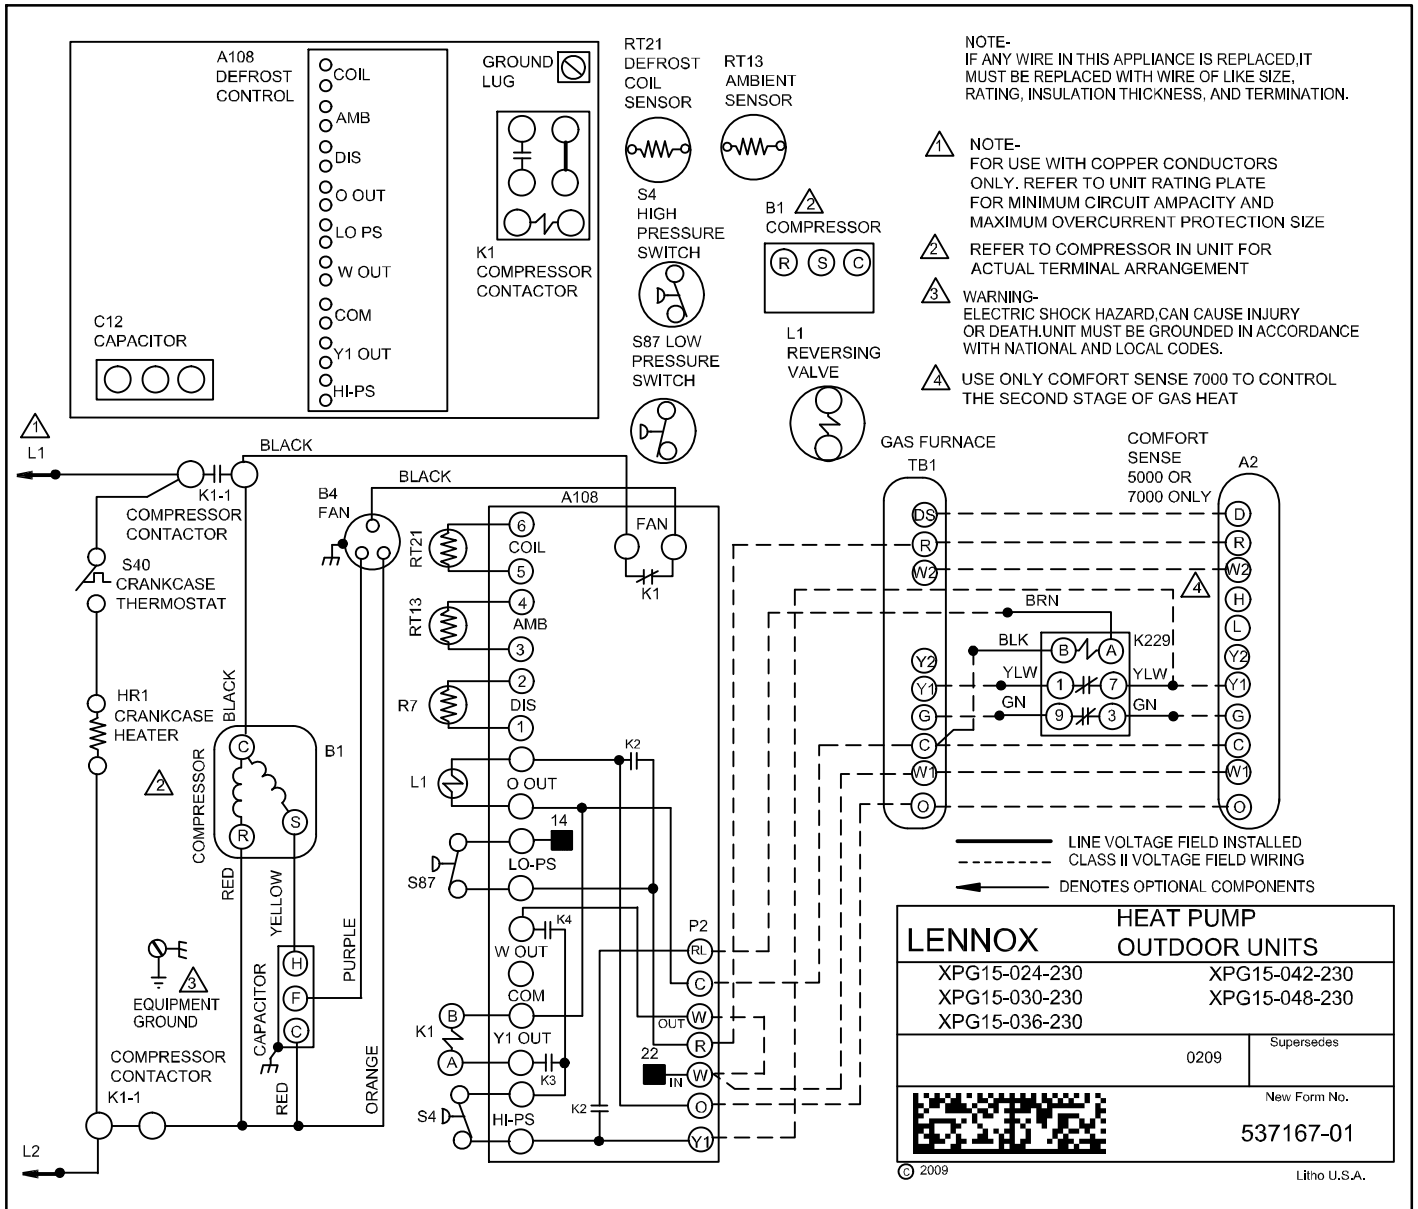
XPG15 (-024, -030, -036, -042 and -048) Wiring using ComfortSense® 5000/7000 Thermostats
